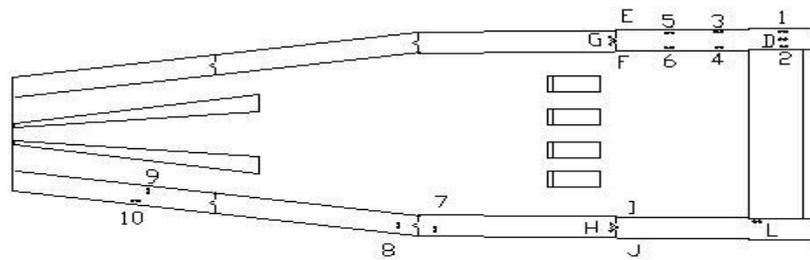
Plan showing schematic location of pins at the dissipation basin walls of Paiva Castro dam (not on scale).
